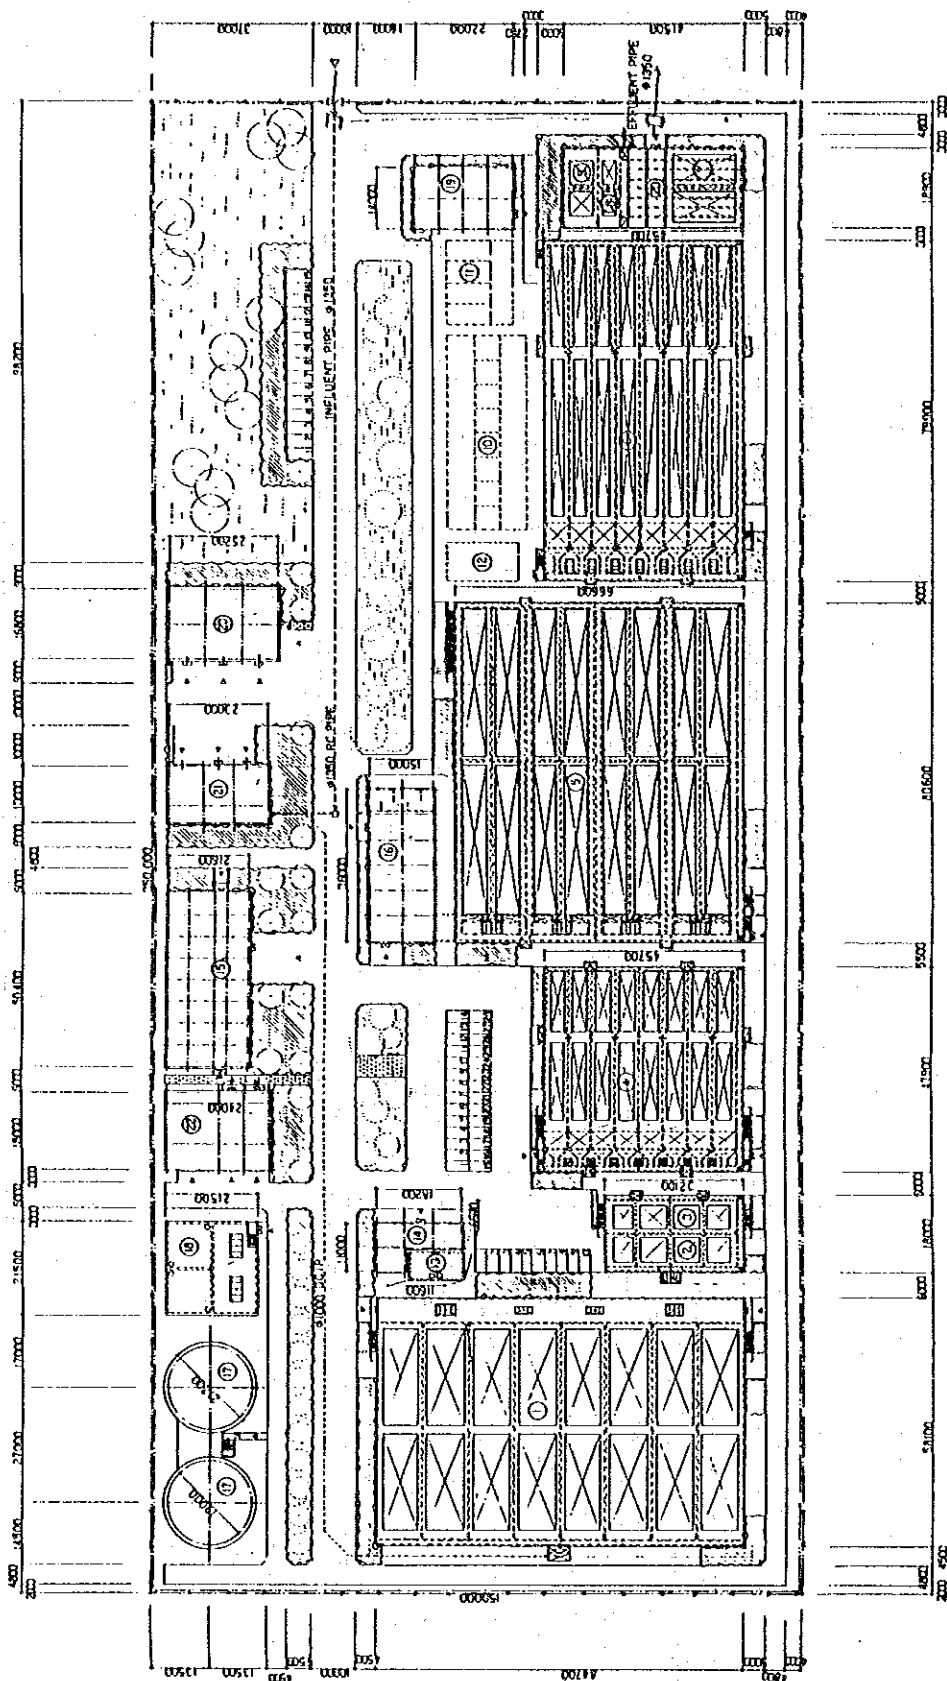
Layout Plan of Wastewater Treatment Plant and Drying Beds
